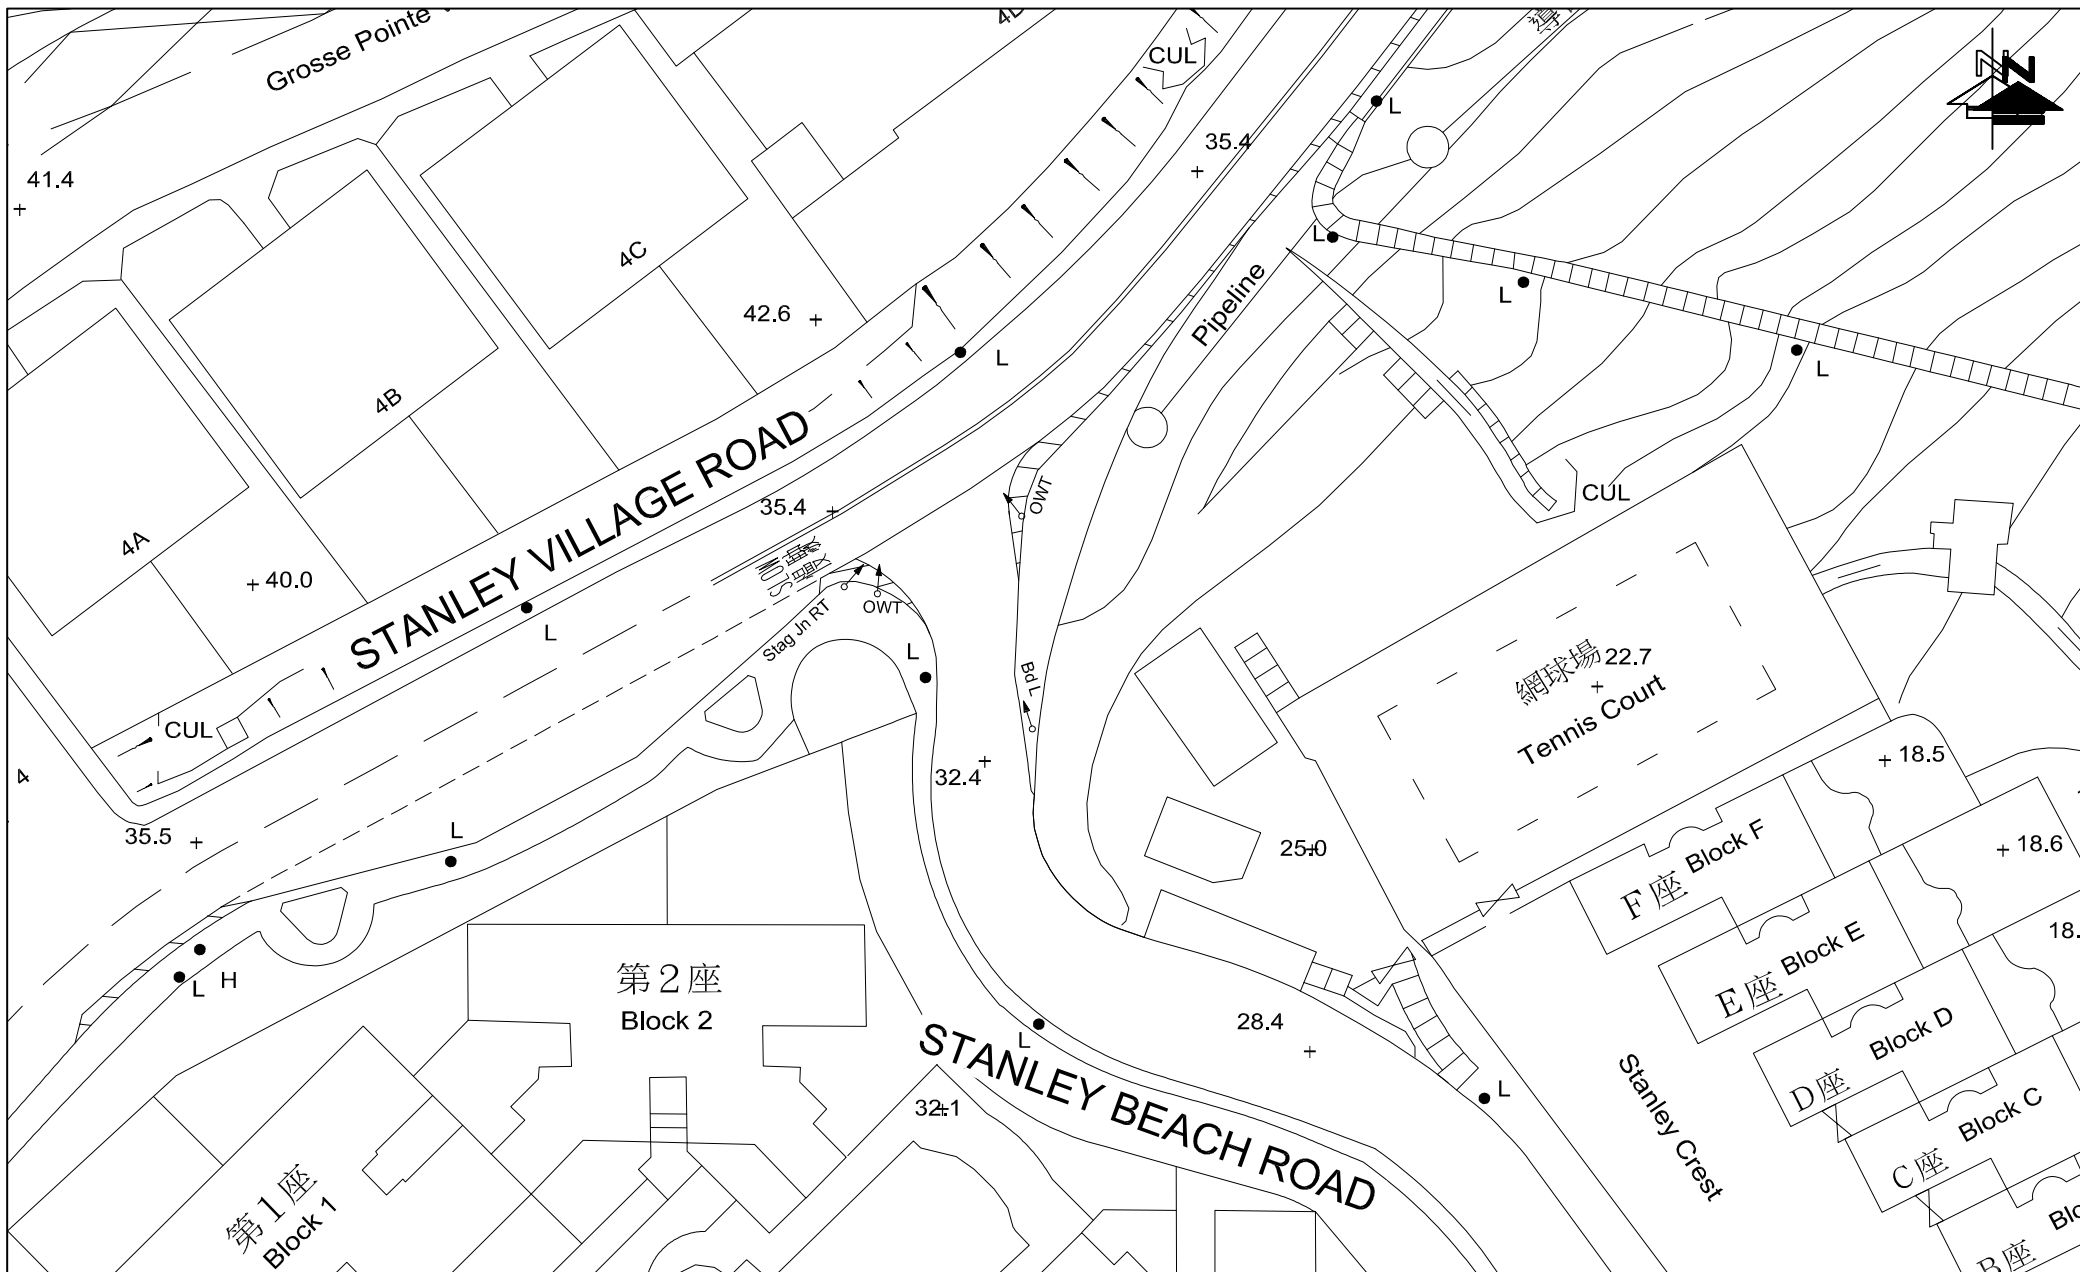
</b>		PROJECT TITLE: Section 16 Planning Application for Minor Relaxation of Plot Ratio, Building Height & Site Coverage Restrictions for Proposed Residential Development at 44 Stanley Village Road, Hong Kong	 <b>CTA Consultants Limited</b> <b>志達顧問有限公司</b>
